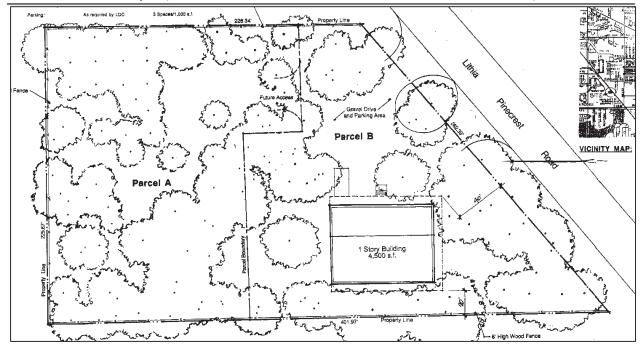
PD 97-0037 Site Plan (Folio 87304.0000)
